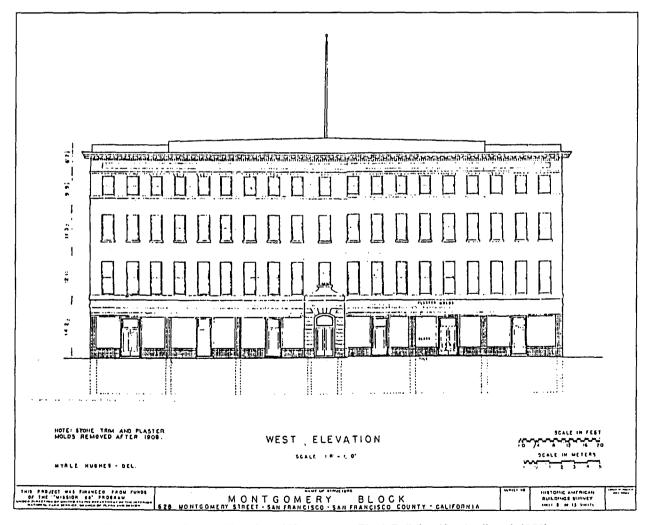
West Facade Elevation of Montgomery Block Building (Cardwell et al. 1958)
